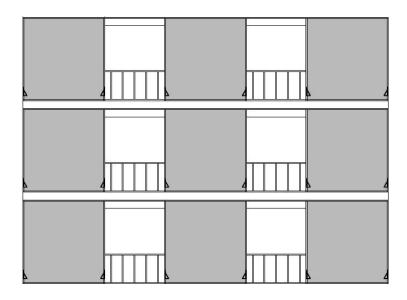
IM9: 3-Story Model, 16 Wood-Frame Structures from AWC
